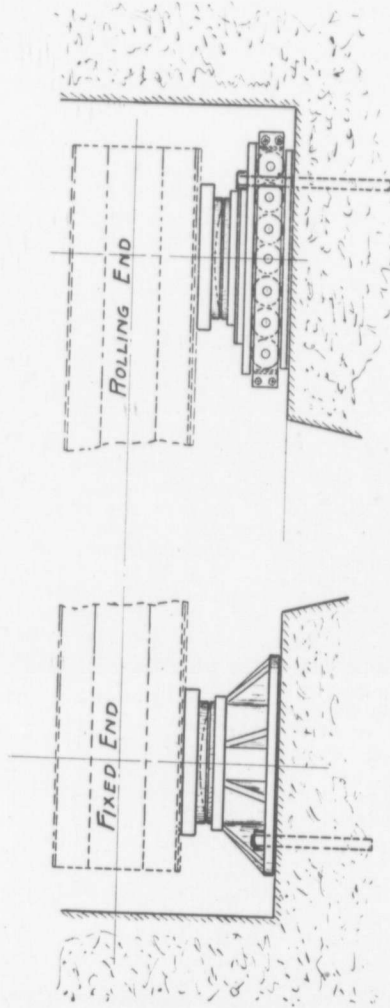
Side elevation of Pier Members for Bridges more than 80 feet long.
